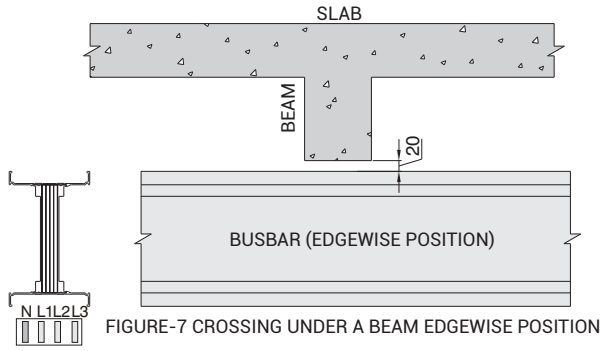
CROSSING UNDER A BEAM EDGEWISE POSITION
